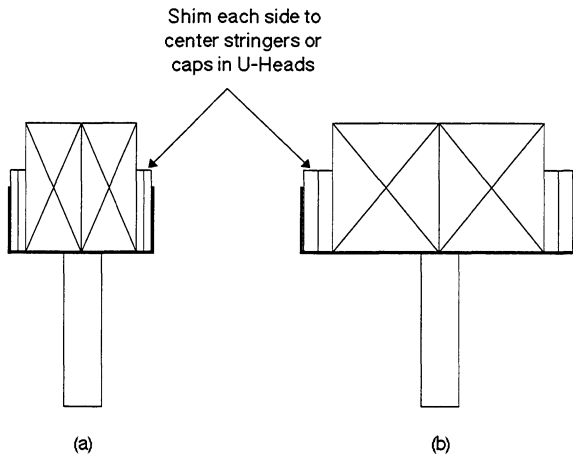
Caps (Ledgers) in U-Heads; (a) two 2-in. (b) two 4-in.
